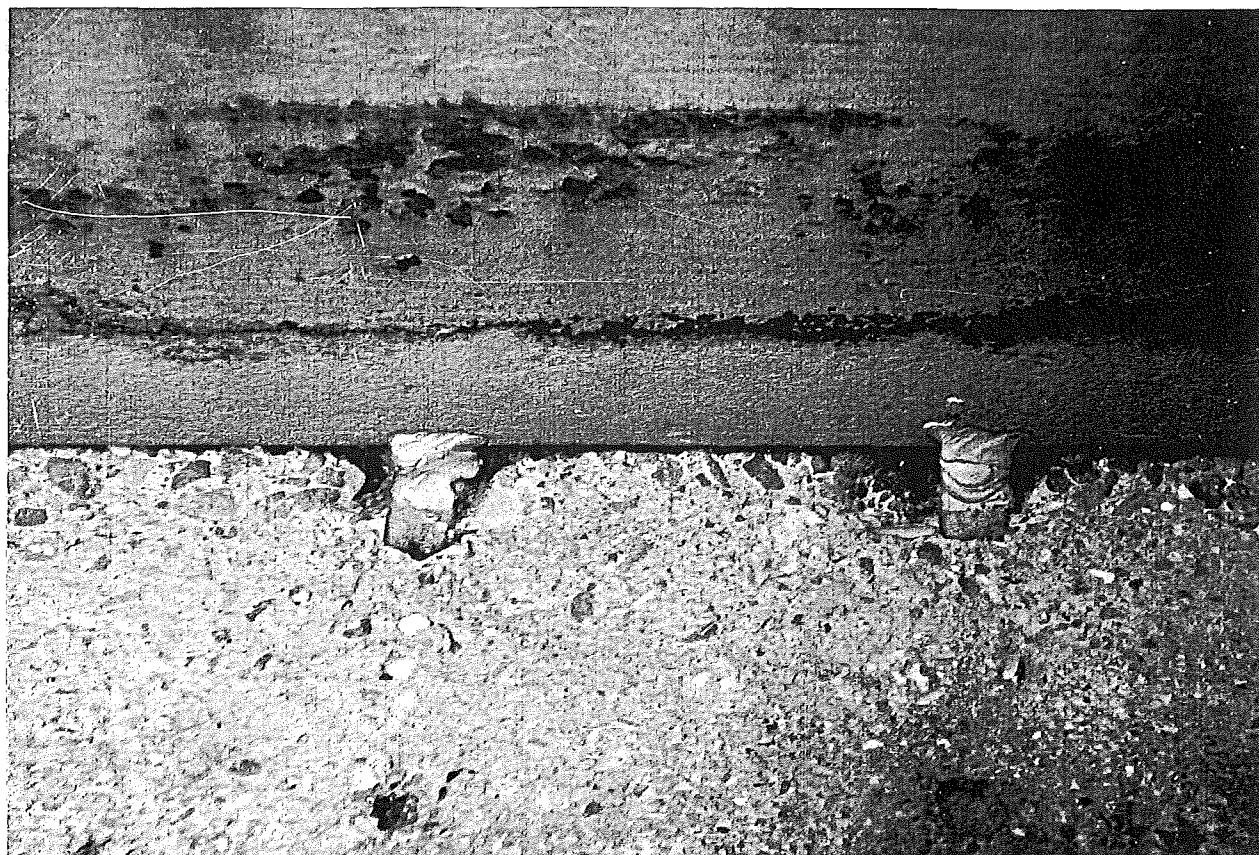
East curb joint after sandblasting, showing transverse steel welds made previously by maintenance crew.
